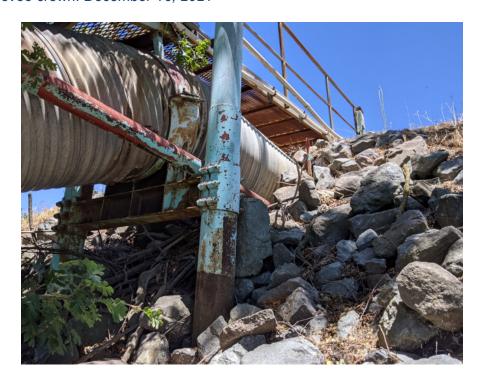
Catwalk, catwalk railing, 36-inch corrugated metal pipe discharge pipe and support piles to be removed on waterside. Looking southwest from the levee crown. December 16, 2021
